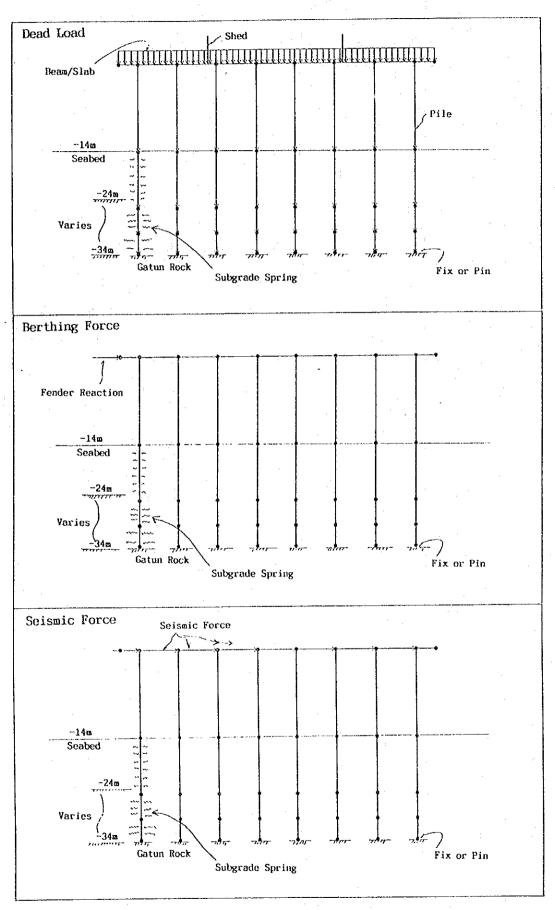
(b) Basic Loading Case: Pier No. 7
